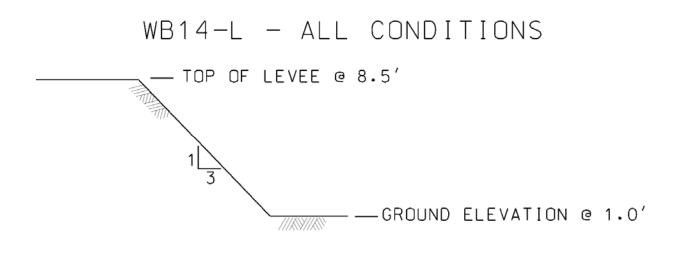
Typical Levee Design Cross-sections Harvey Canal Levees (WB14-L)
